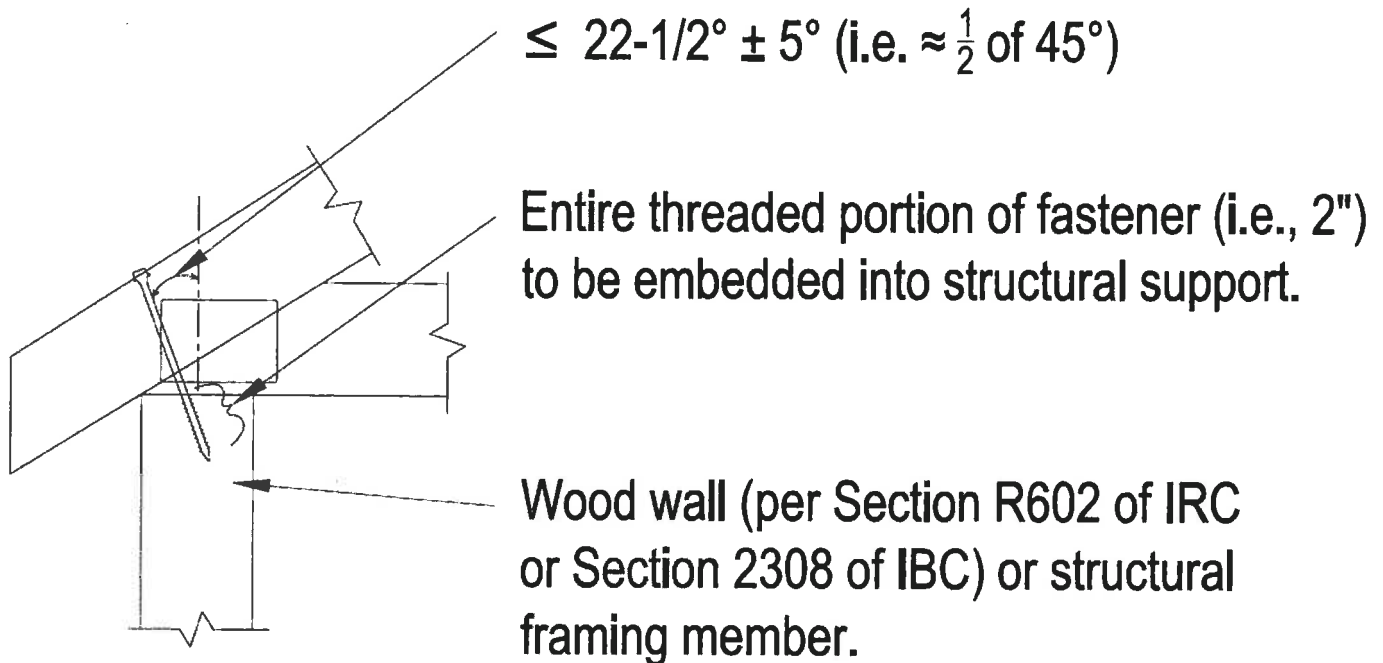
Fastener Orientation Requirements for Attaching Wood Trusses, Rafters or SCL from Above to the Top of a Wood Wall or Structural Framing Member
